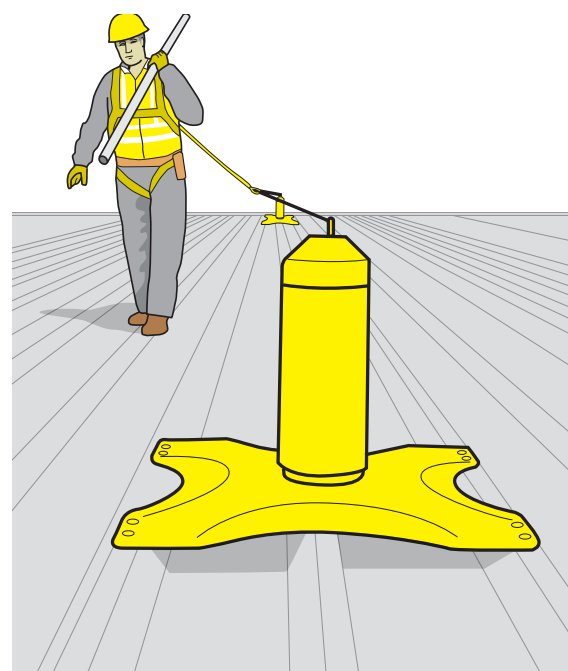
Scaffolder utilising an installed fall protection system for roof access.
